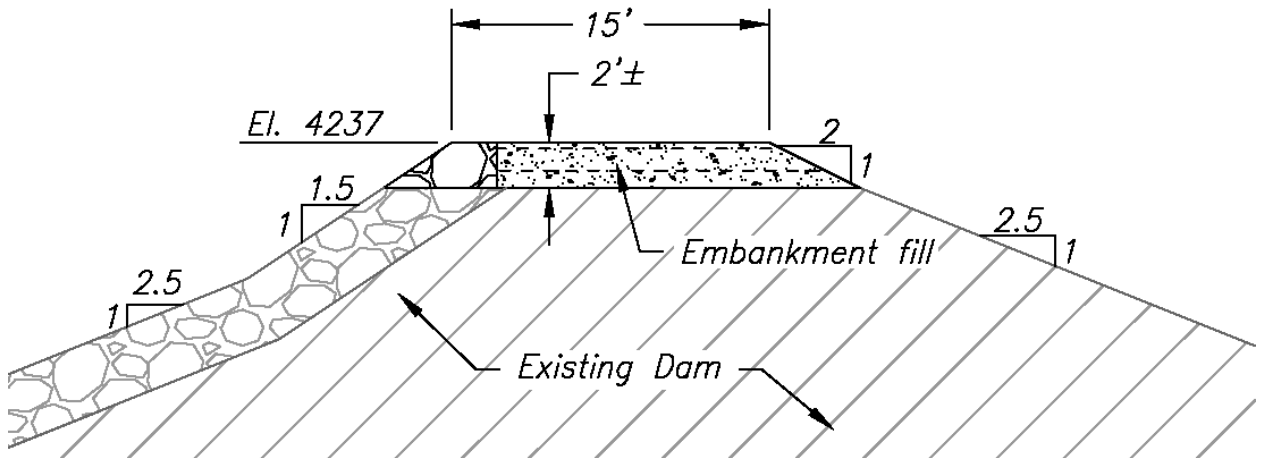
Typical cross section of crest raise from Station 400+00 to 750+00
